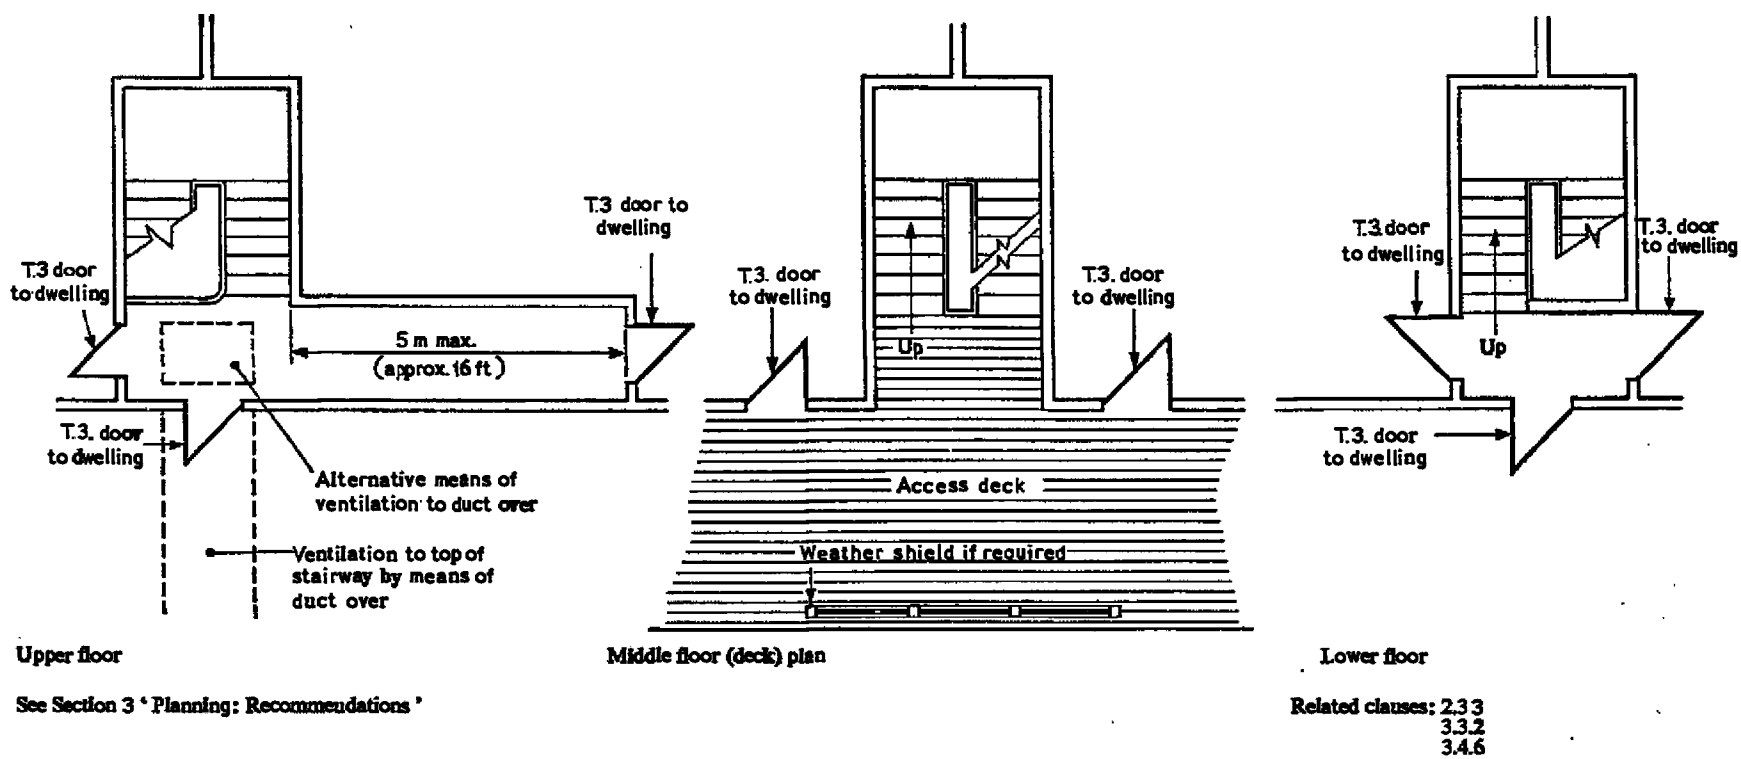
Dwellings entered off balcony or deck (via subsidiary stairway)
